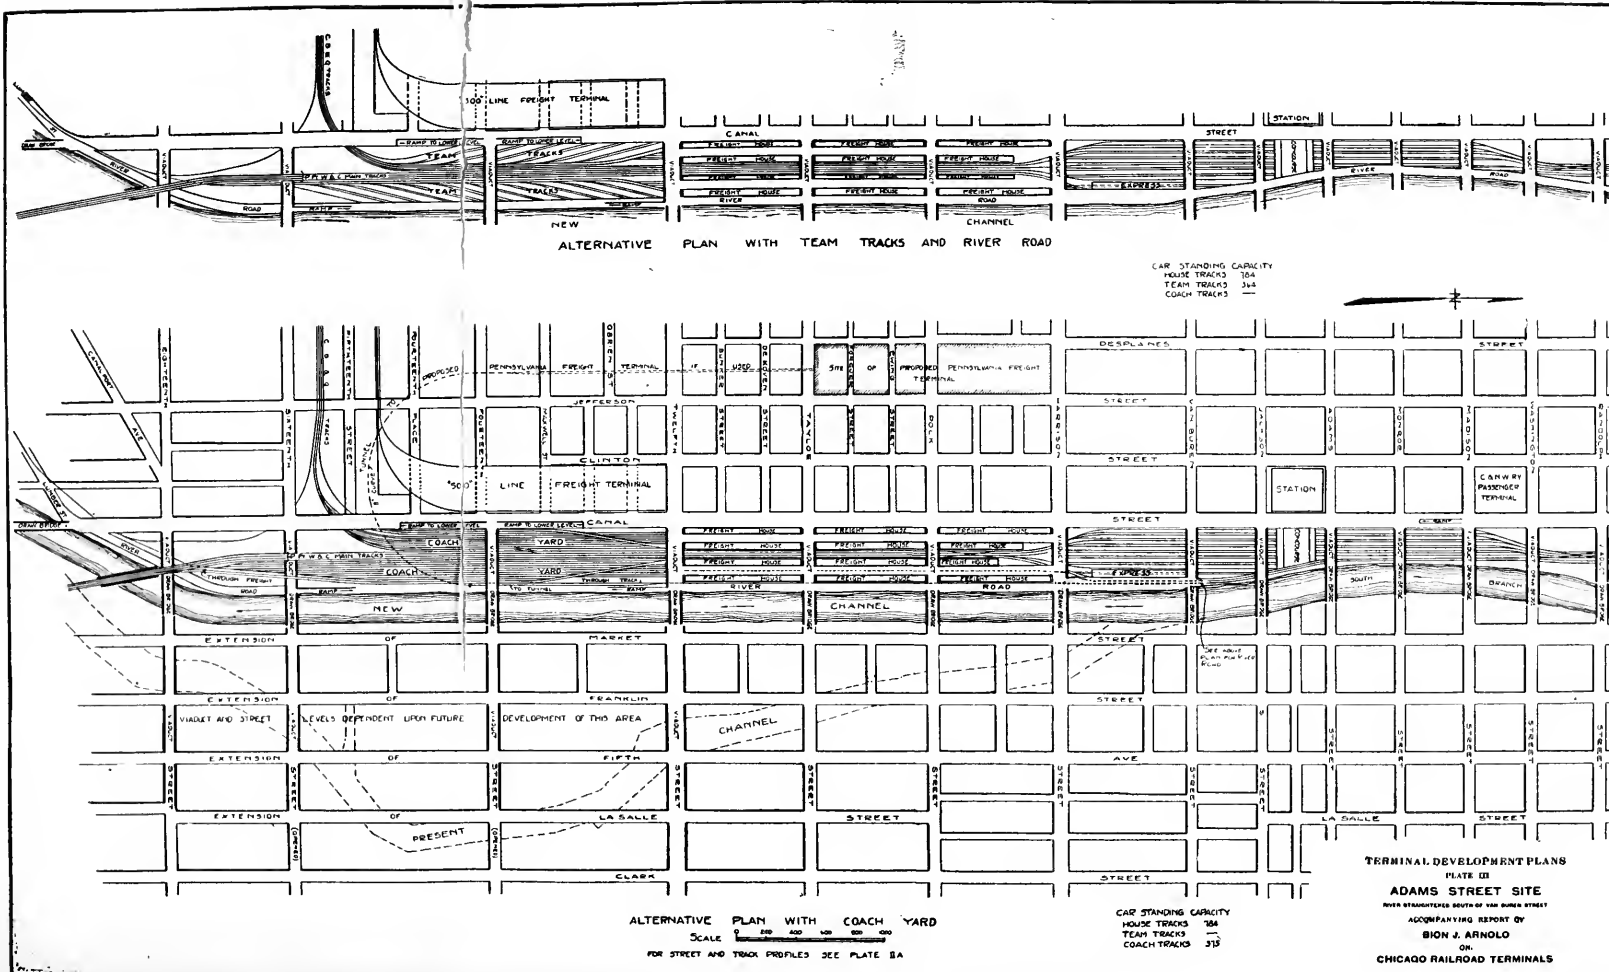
WEST SIDE UNION STATION AT ADAMS STREET.
